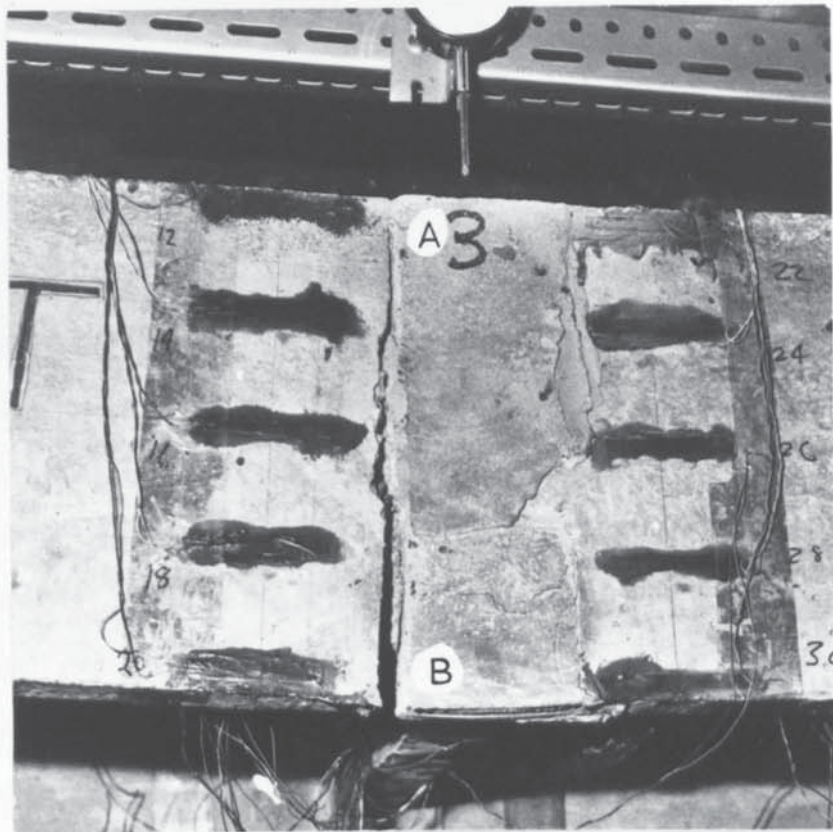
FAILURE OF STRUCTURE 11 IN THE SLAB
